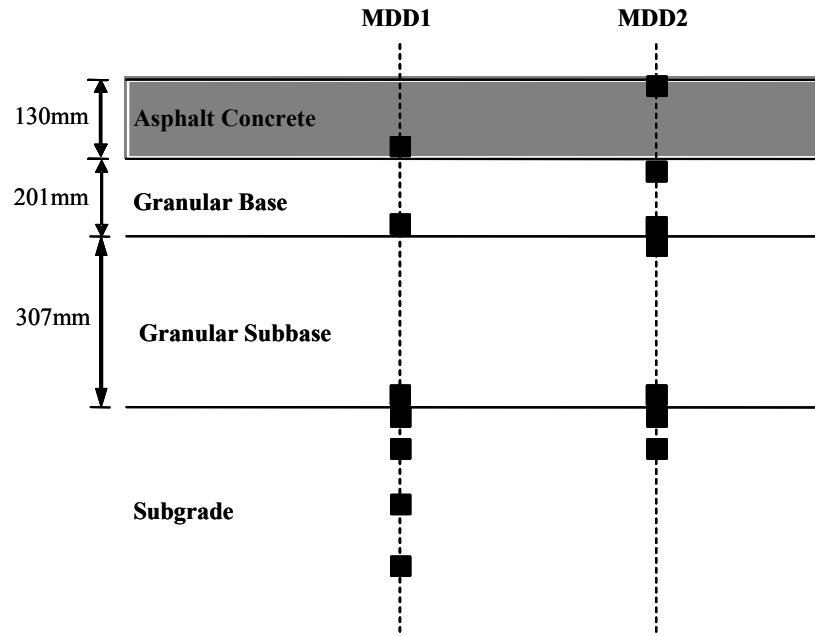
Cross Sections of NAPTF Pavement Test Sections (Garg, 2003)
